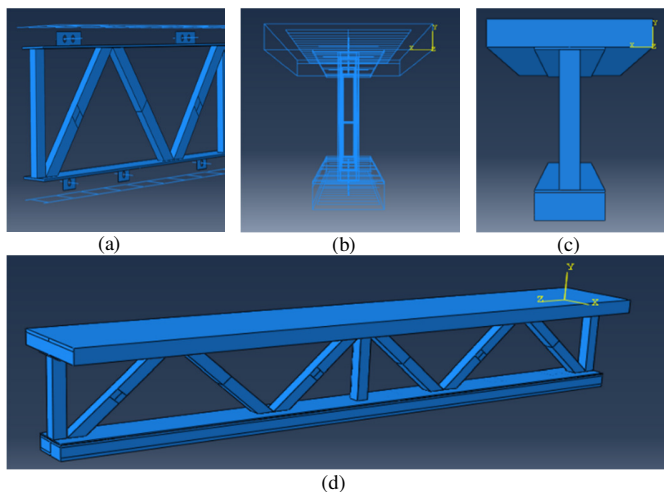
Assembly of DCTG models: (a) top and bottom PRL with BRC mesh (300 × 150 × 6 mm), (b) detailed front view of the connection, (c) front view of the double composite truss girder, (d) 3D view of the assembled double composite truss girder.
